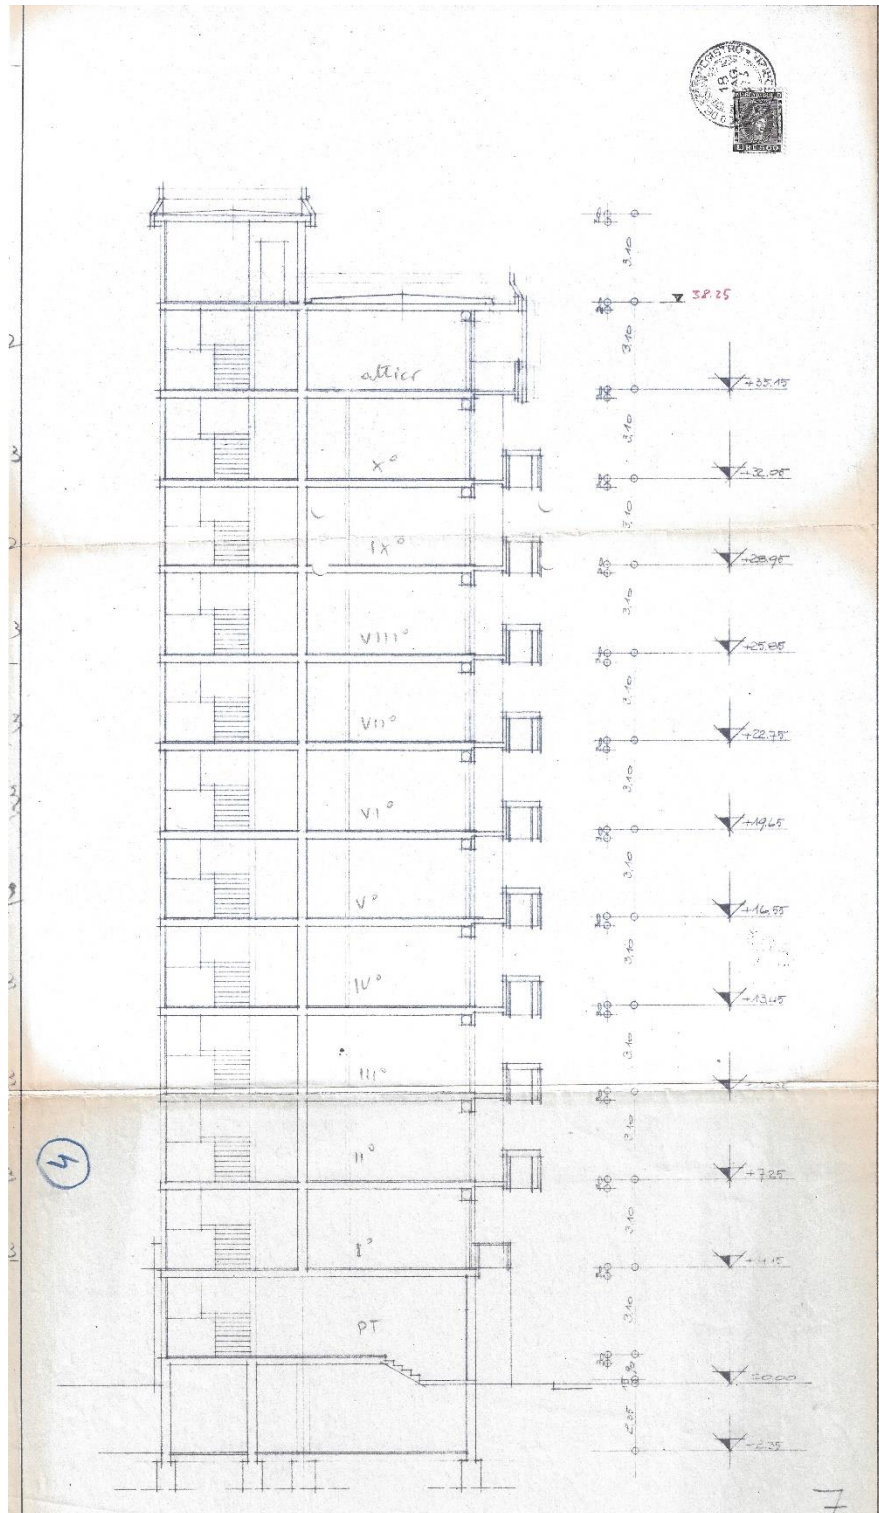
Architectural design project of the building (scan of the original document) – section updated at the 3<sup>rd</sup> of June 1968.
